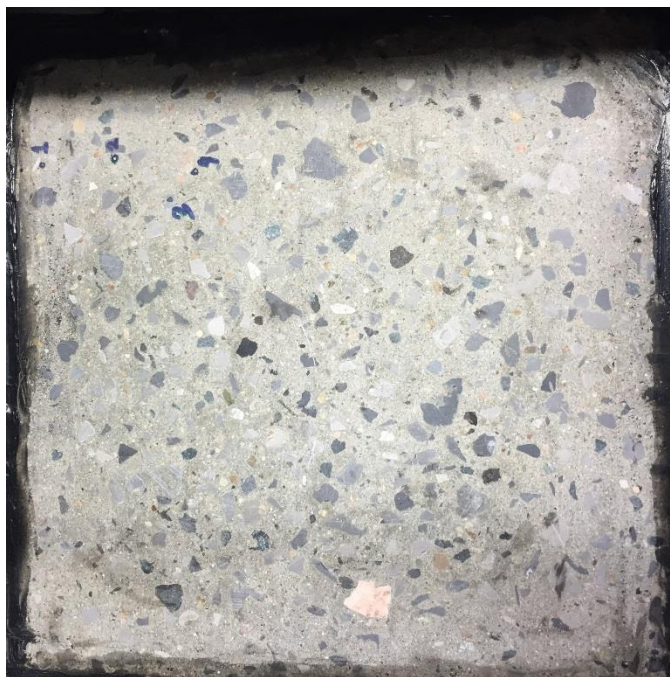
A photograph of smooth surface concrete slab covered with rocks
